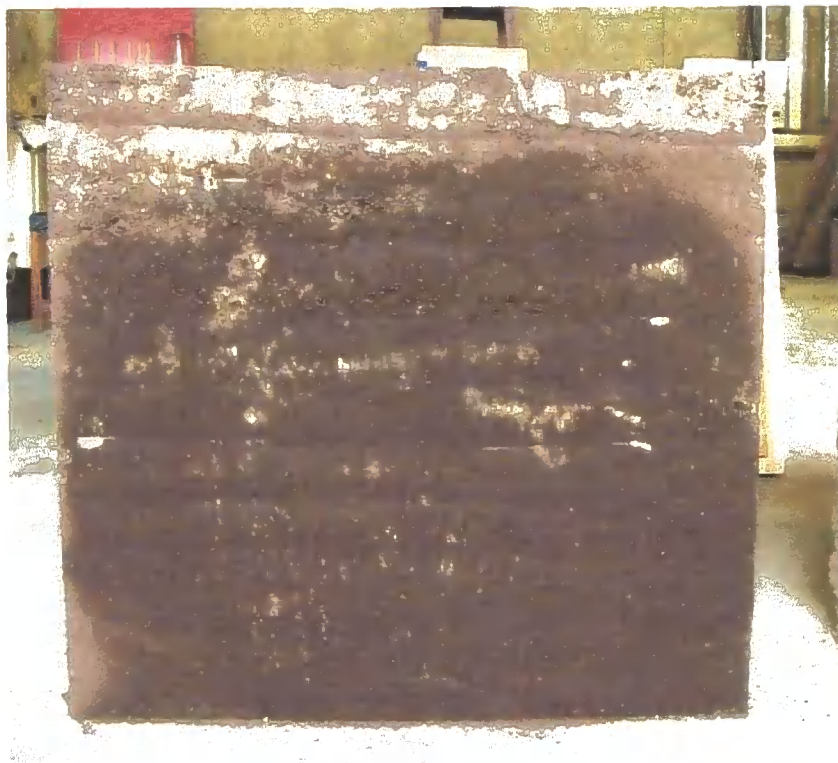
Wall 2 drying, 27/05/05, day 4
